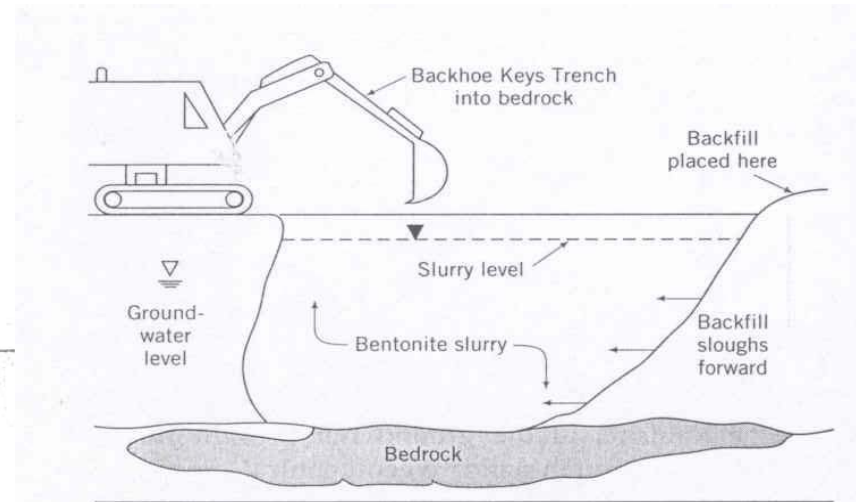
Schematic of the preparation of a slurry wall (from U.S. EPA, 1985).
